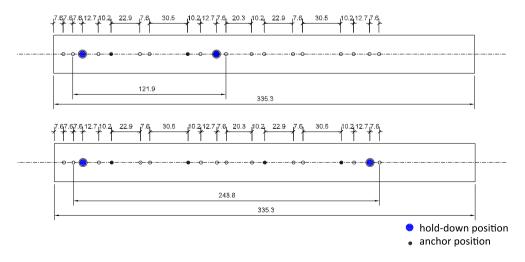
Shear wall anchor and hold down position for 1.22 m × 2.74 m shear walls (top) and 2.44 m × 2.74 m shear walls (bottom). All units are in centimeters.
